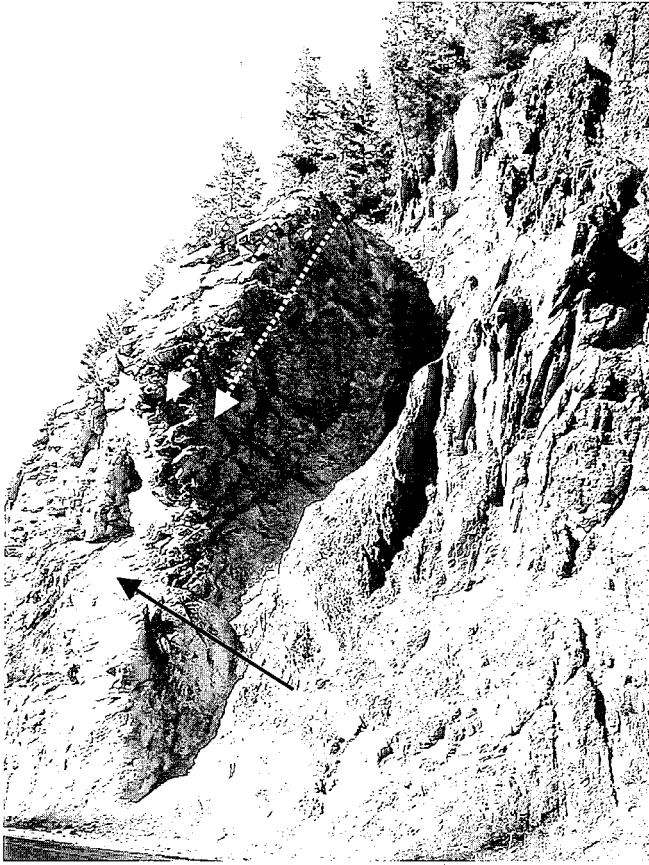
Pre Construction Drilling Alternatives for GreenStone Block Blast Holes
